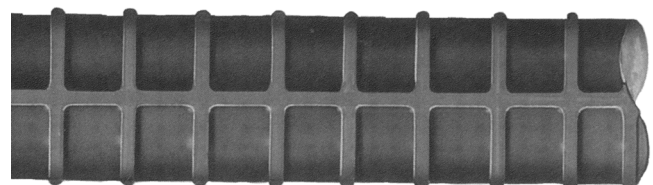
Typical deformed reinforcing bar (courtesy of Concrete Reinforcing Steel Institute).
